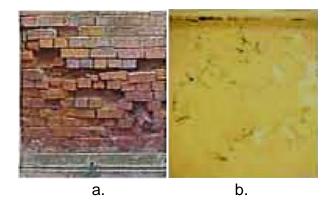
The characteristic of rising damp and falling damp : a. rising damp and b. falling damp (Heritage Victoria, 2008)
